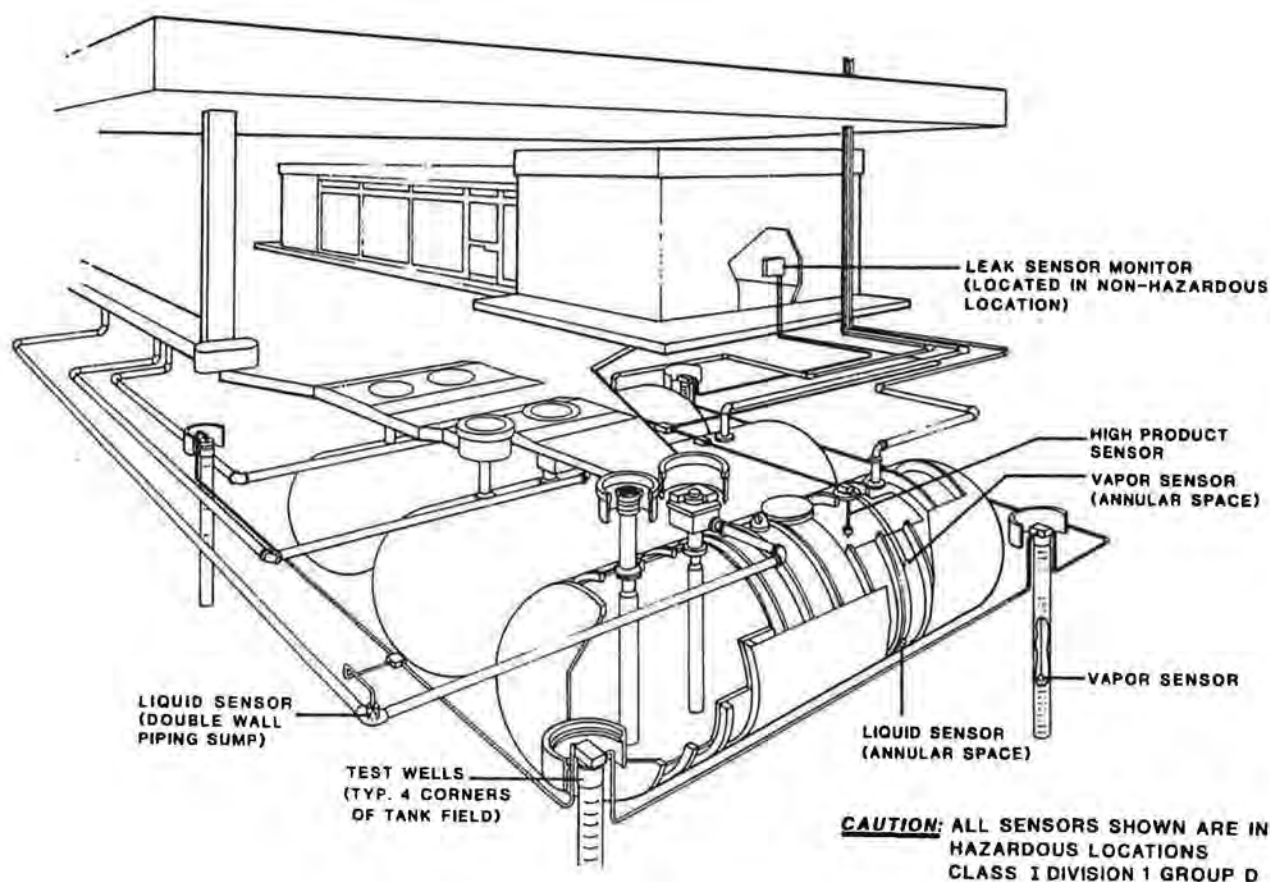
TYPICAL INSTALLATION (Drawing Q0340-104-41 Sheet 1)
